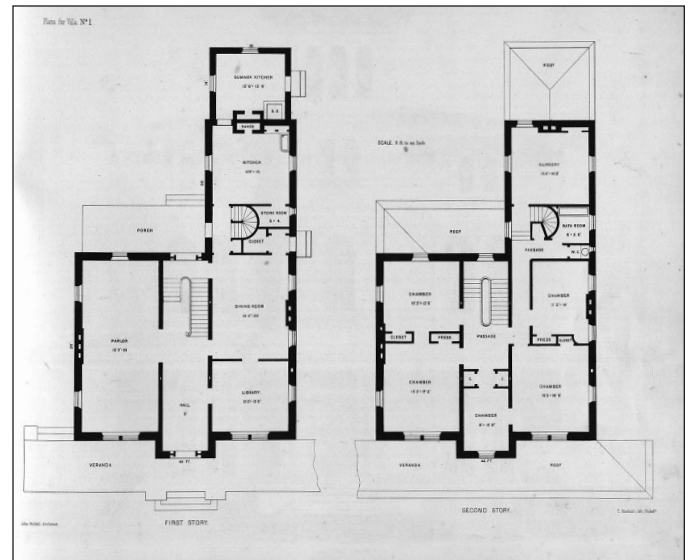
Depicted above is the floor plan the house seen in Fig. 4. Note the numerous rooms and the library space off of the dining room.
